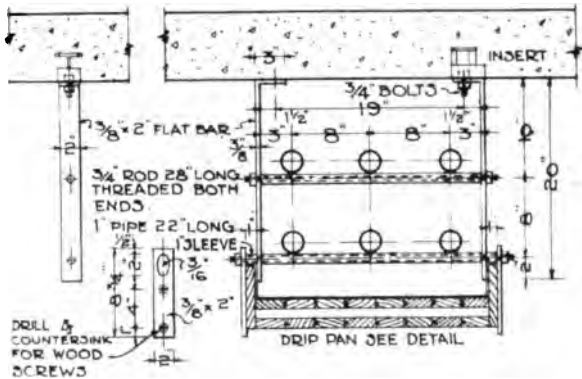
DETAIL OF HANGER FOR CEILING COIL.
